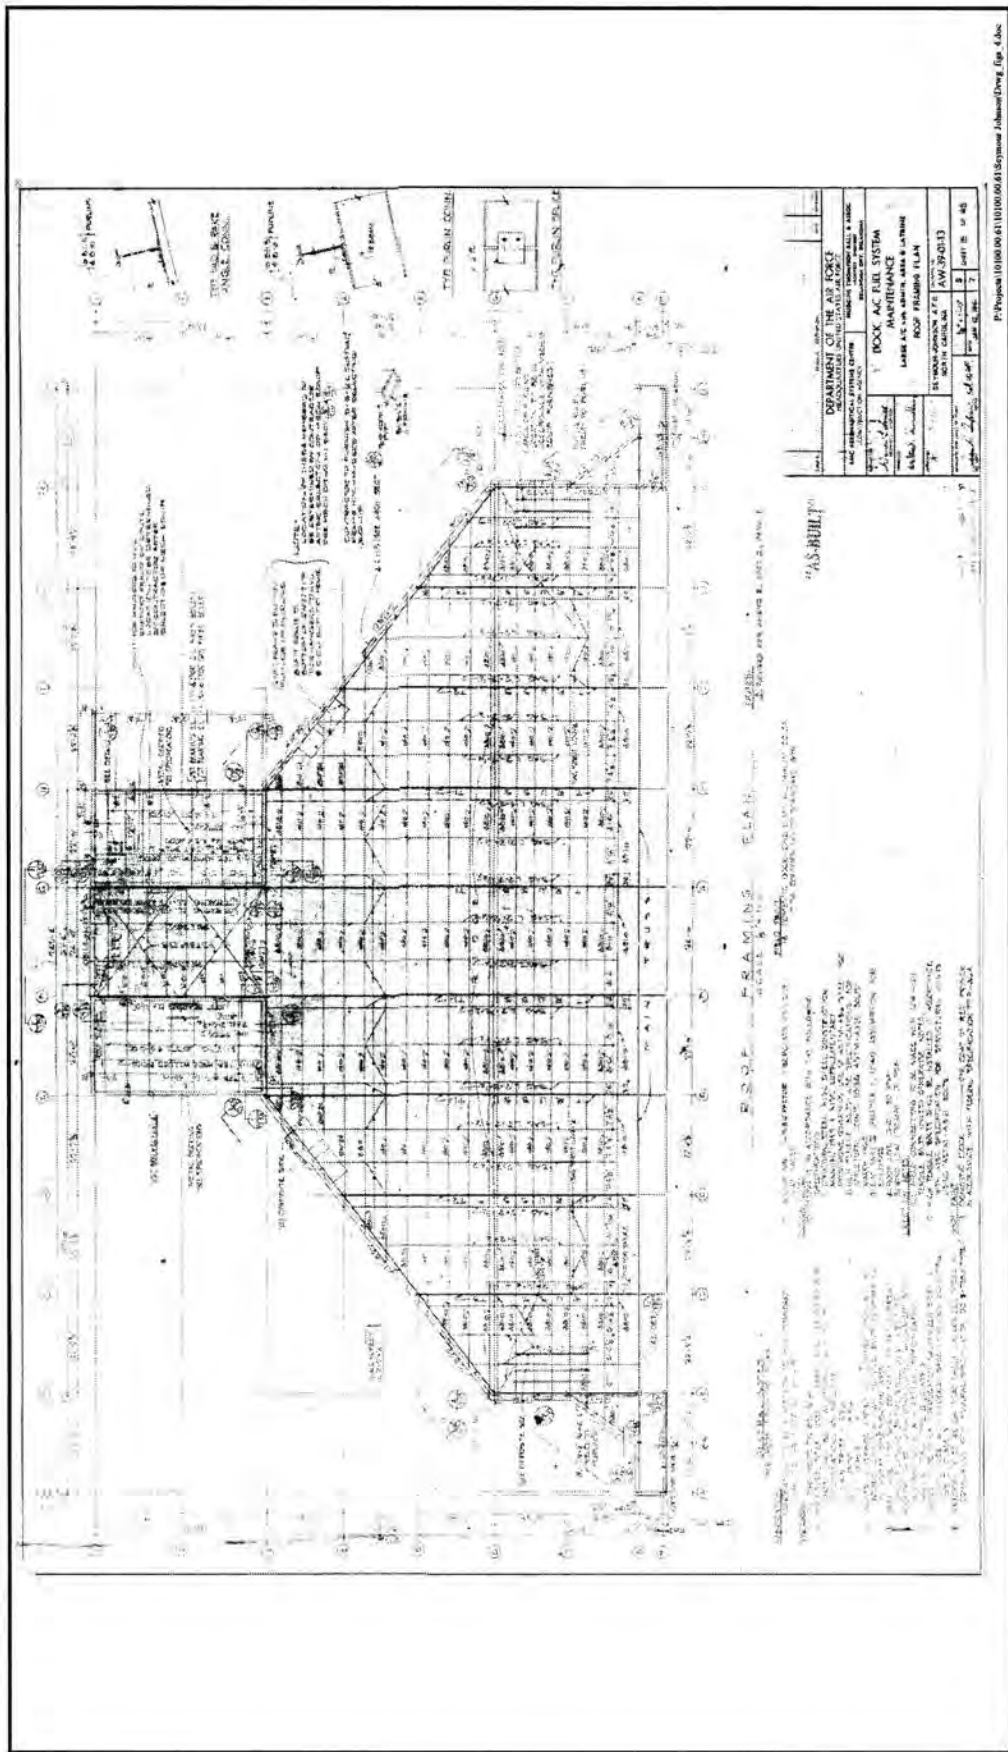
Building 4828—record drawing, roof framing plan, 1961 (Source: Seymour Johnson Air Force Base Civil Engineering Vault).
